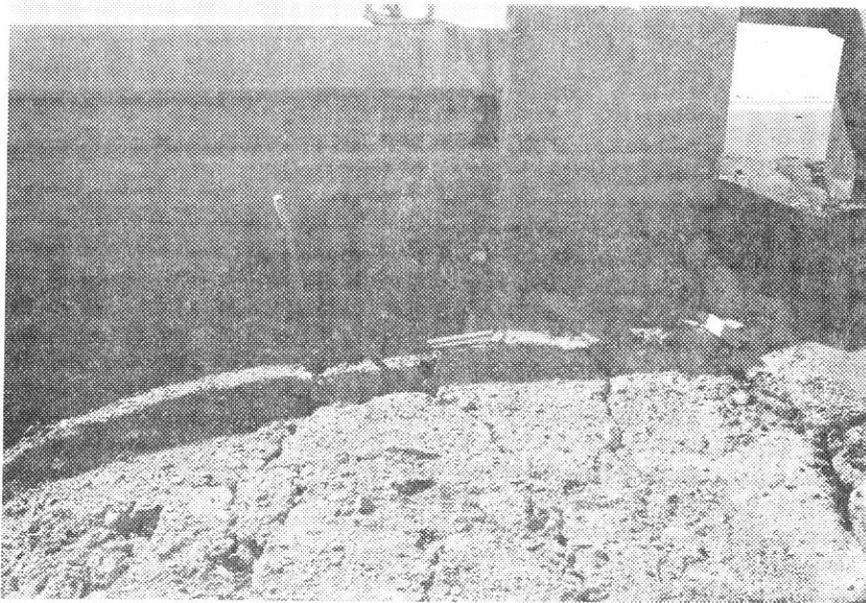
Fill cracking and settlement in median at Yarnell Street Undercrossing.
